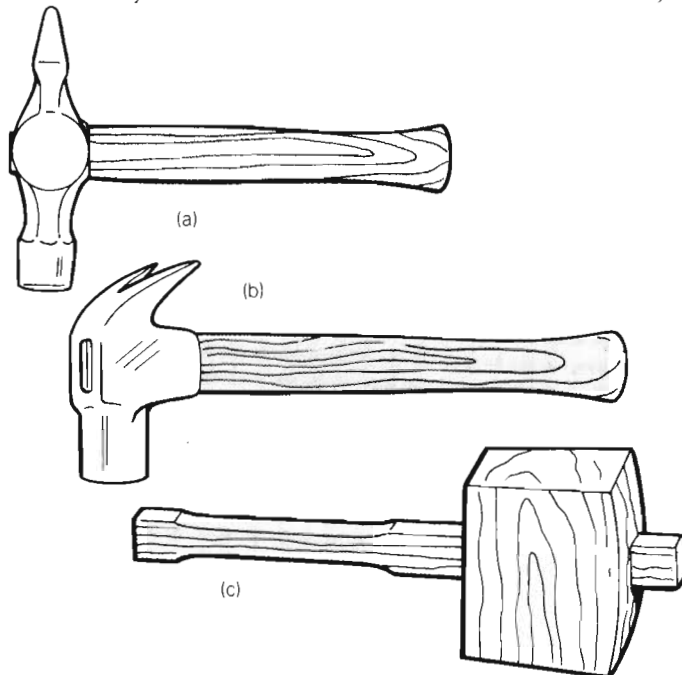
Percussion tools: (a) Warrington hammer, (b) claw hammer, (c) mallet.
